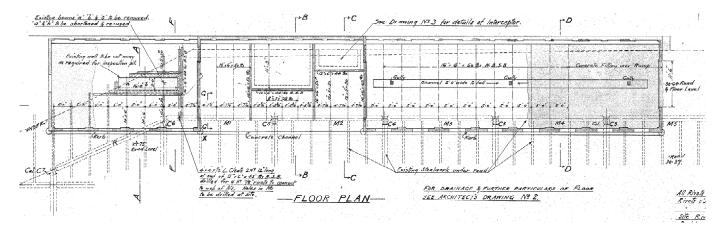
Plate J: Extract showing detail of plan of 'New Transport Service Station' including supporting structure below London Street Deck
